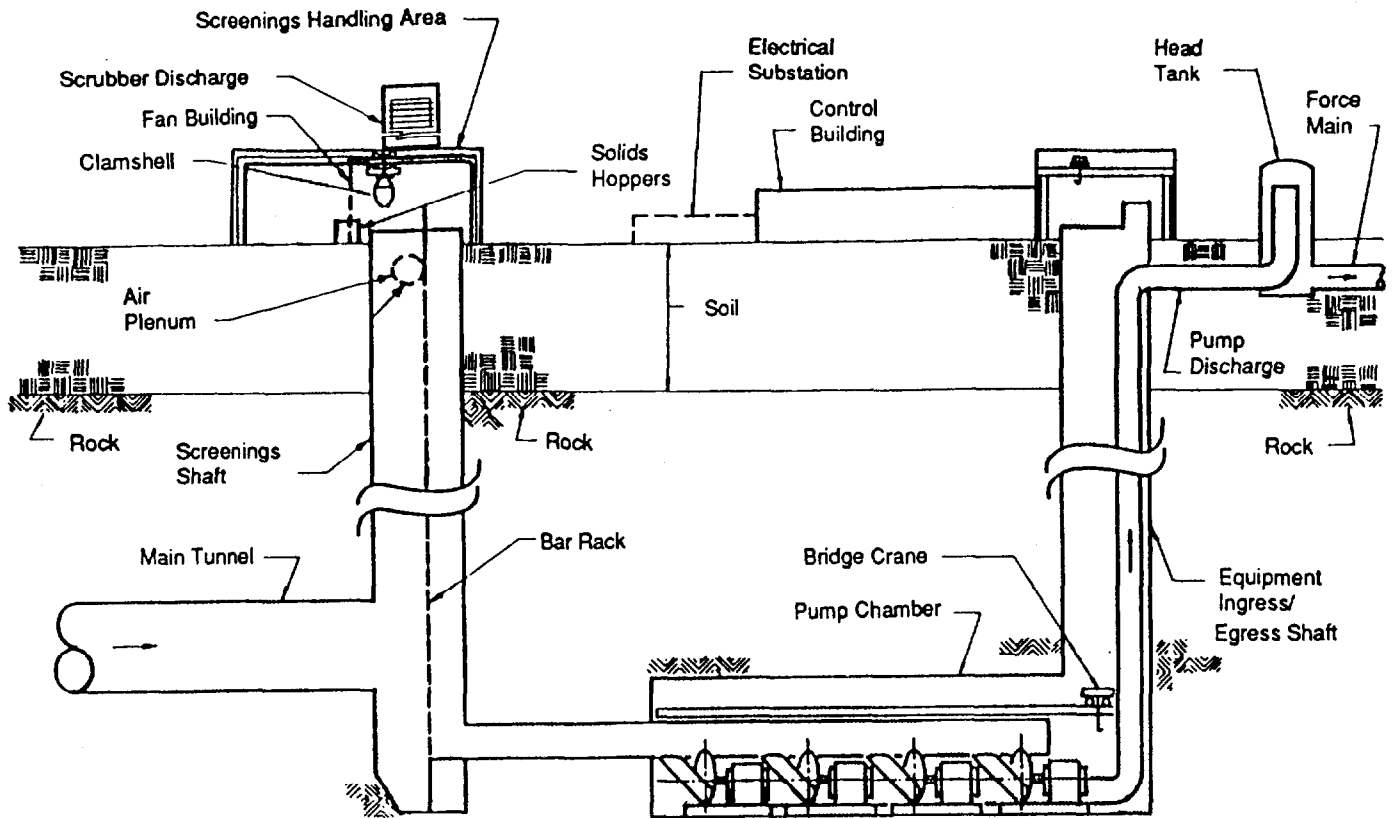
Tunnel system dewatering pump station (MWRA, 1990).
